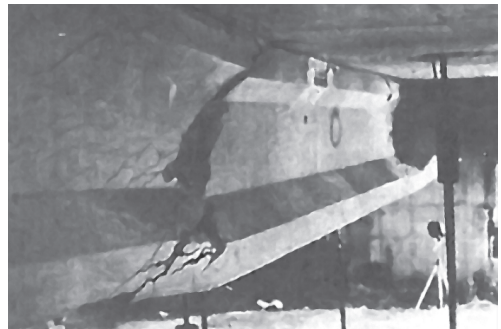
The Boiling Fork Creek Bridge after shear failure of the PC girder (Burdette & Goodpasture 1973).
